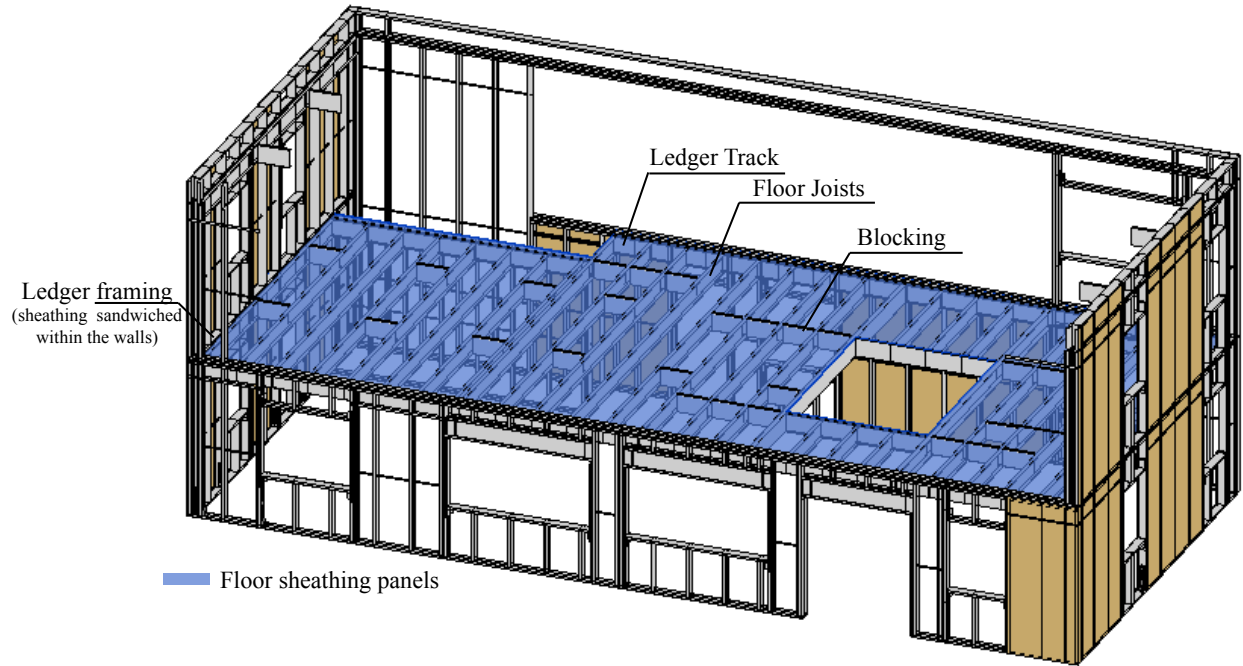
Description of the diaphragm subsystem showing joists, ledger tracks, sheathing and ledger framing [61, 78]
